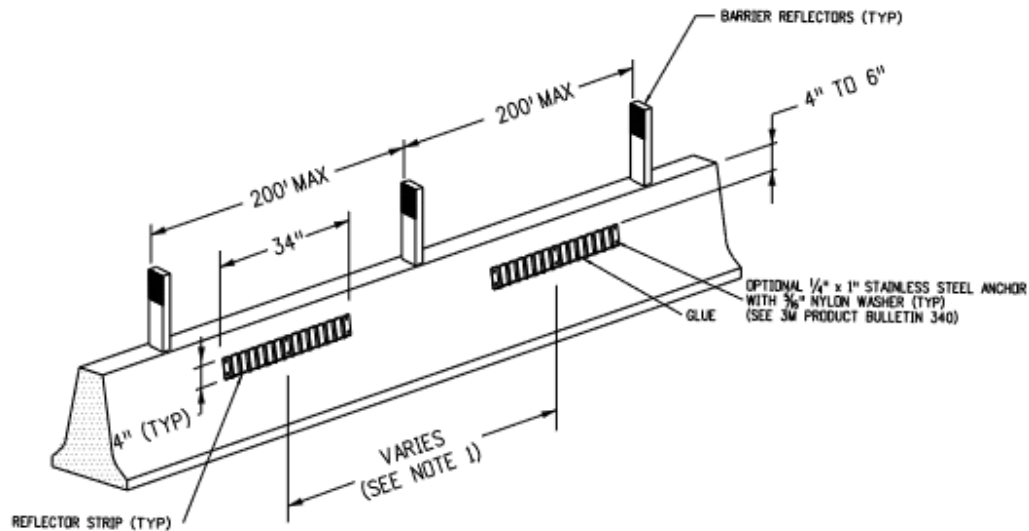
Typical Installation Detail for Continuous Concrete Barrier and Guardrails (8).
